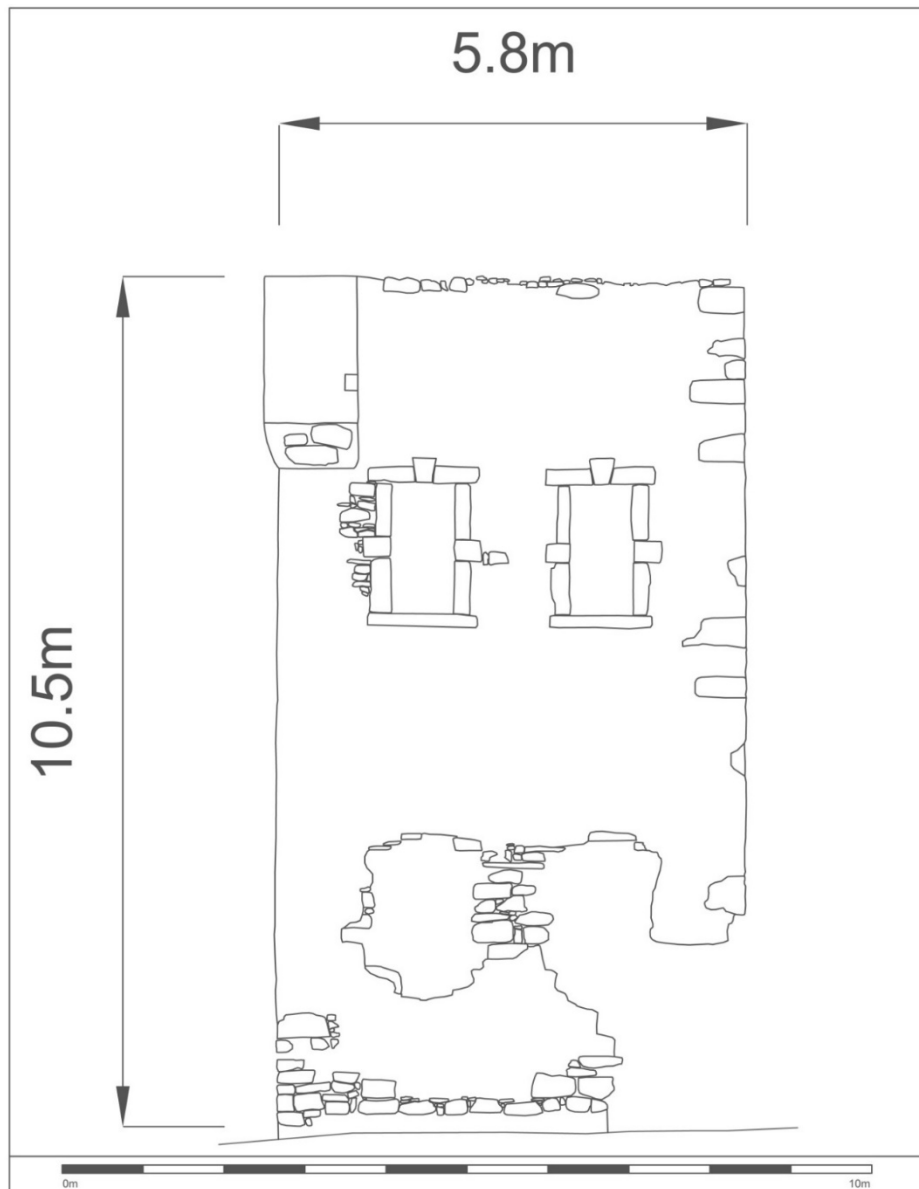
External elevation of the east wall of the signal station at Rathlee Signal Station.
